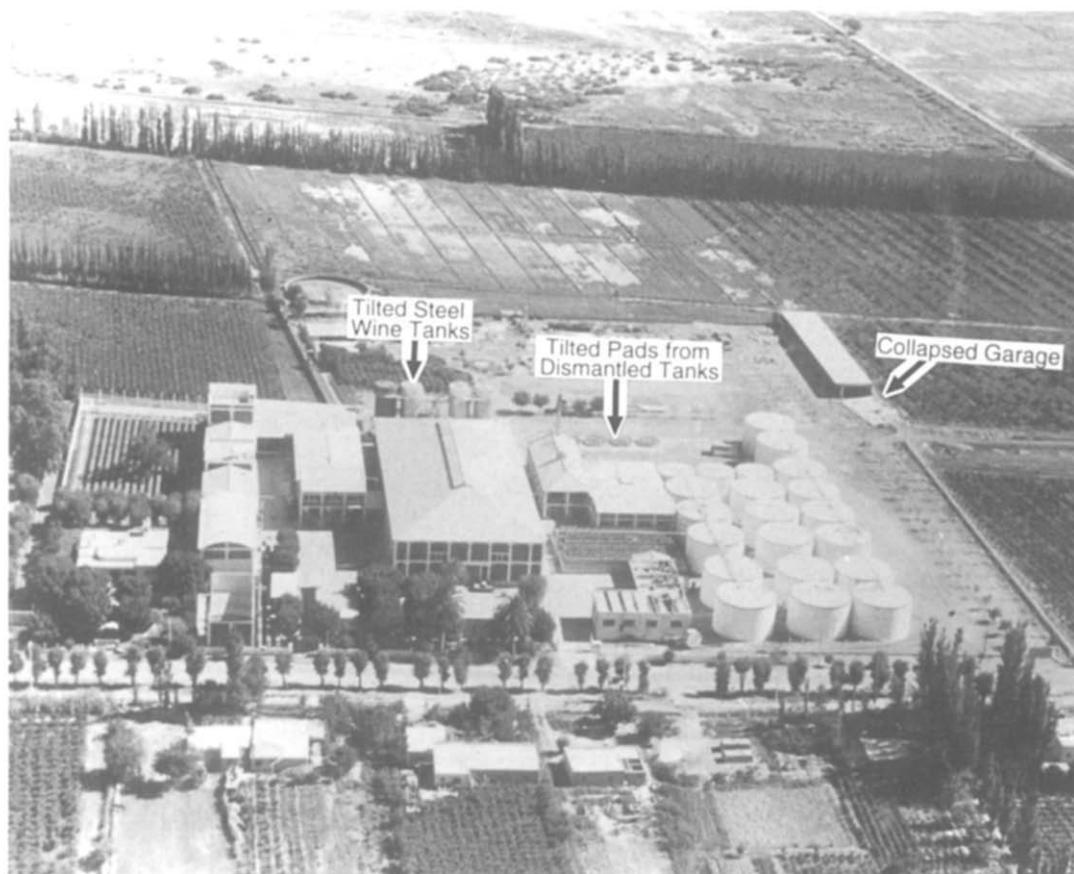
Aerial photo of San Isidro Winery showing locations of tilted tanks and other damaged facilities. View looking north.
